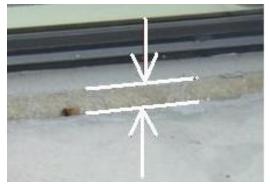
Piled foundation unaffected by global settlement of ground due to liquefaction.
